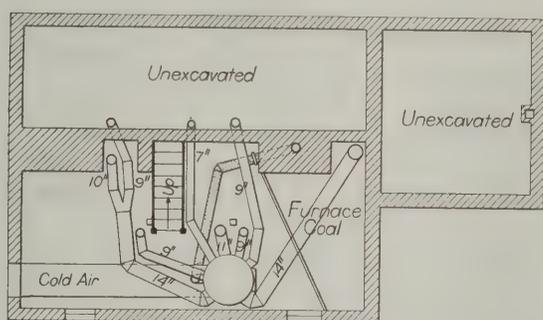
Basement Plan, Showing Location of Furnace, Air Supply Duct and Piping to Horizontal and Vertical Trunk Mains
